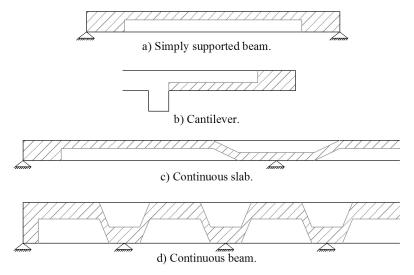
Non-cracked concrete locations (shown as diagonal lines) in common beam and slab systems.
